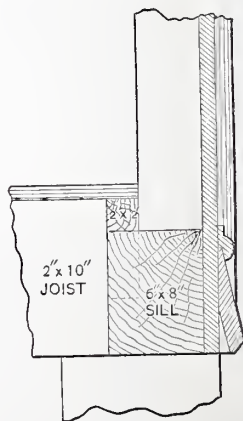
Vertical Section Through Sill and Water-Table.—Scale, 1 Inch to the Foot.
